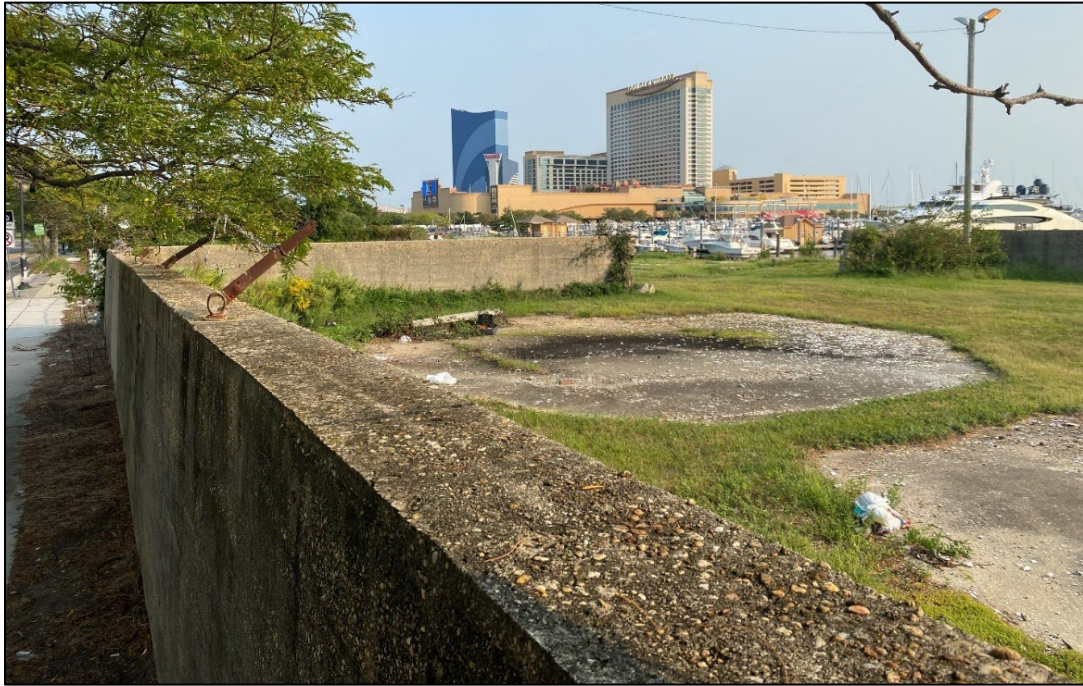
Overview of partially collapsed wood and concrete bulkhead facing the marina. View to the south.
